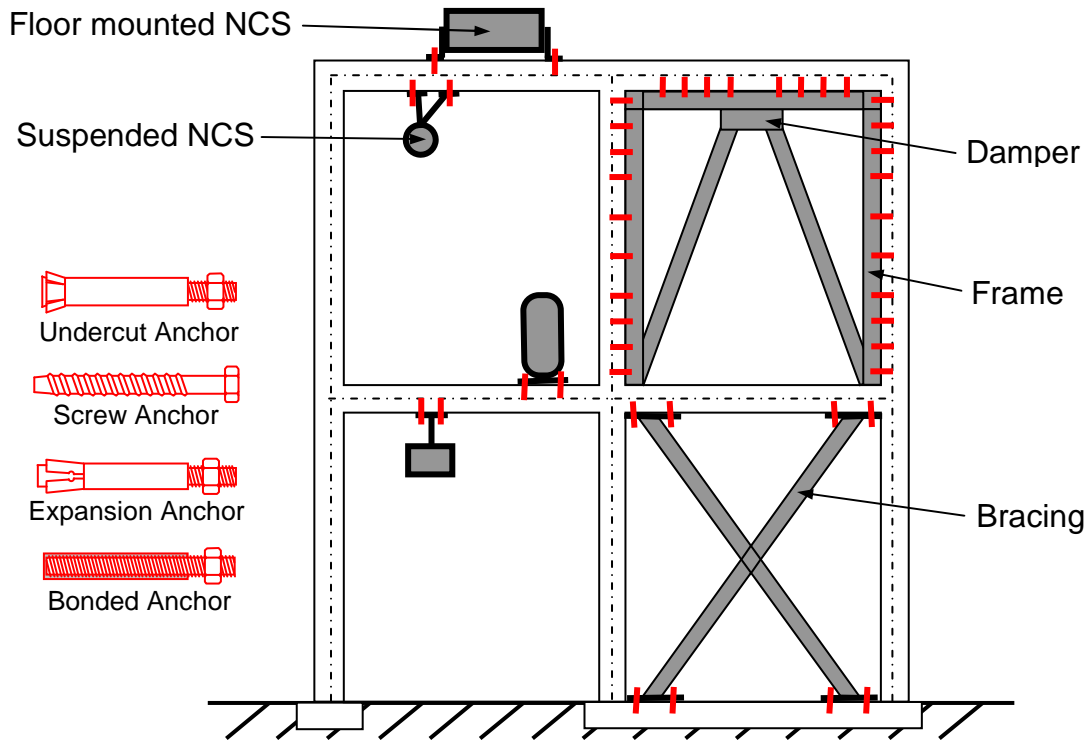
Typical anchors and structure with structural and non-structural connections (schematic)
